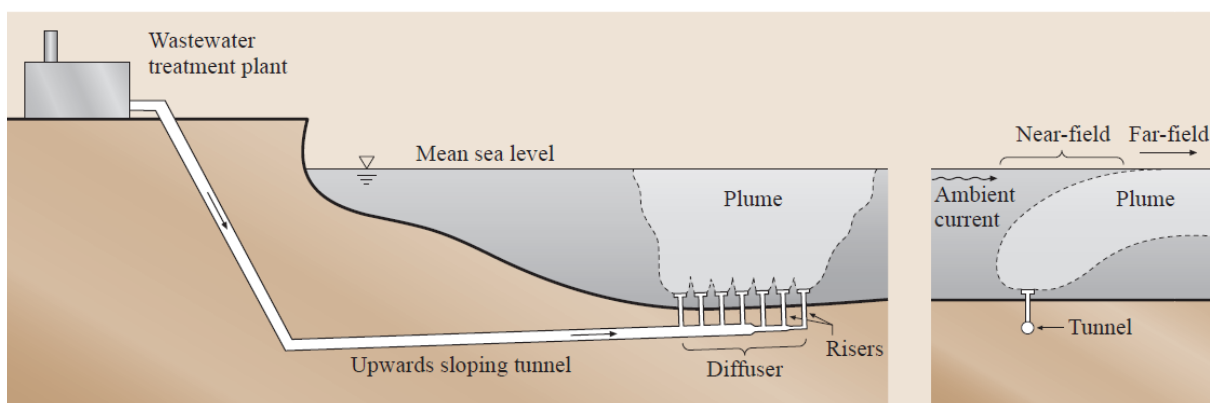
Schematic of a typical wastewater treatment plant outfall. Source: Tate, et. al. (2016).
